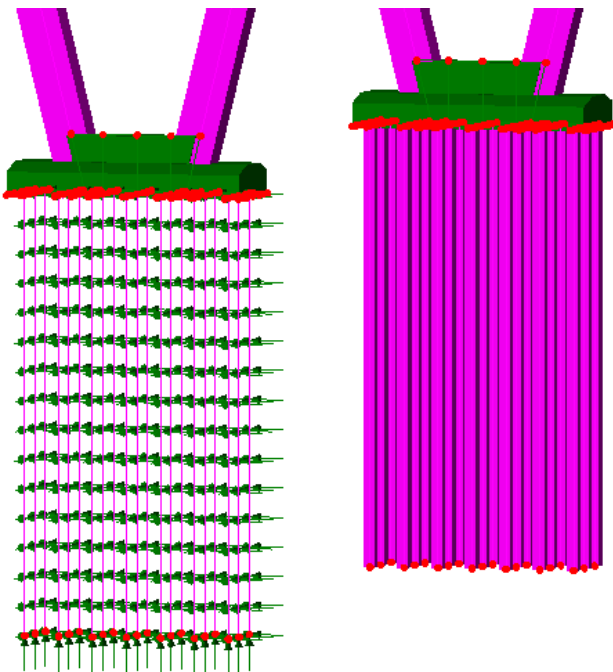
Model of pile foundation in the structural FE-program for middle foundation
